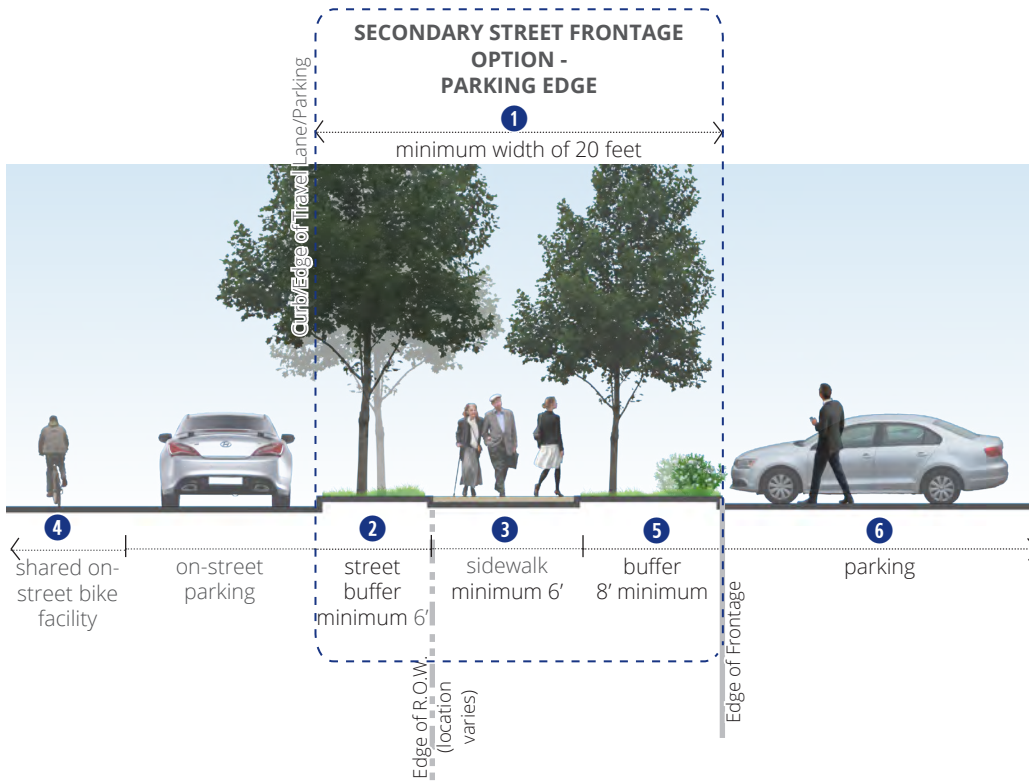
Secondary Street Frontage Option - Parking Edge
